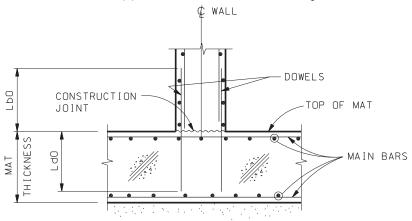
A-38 Typical Reinforcement of the AB Basemat (Section B)
